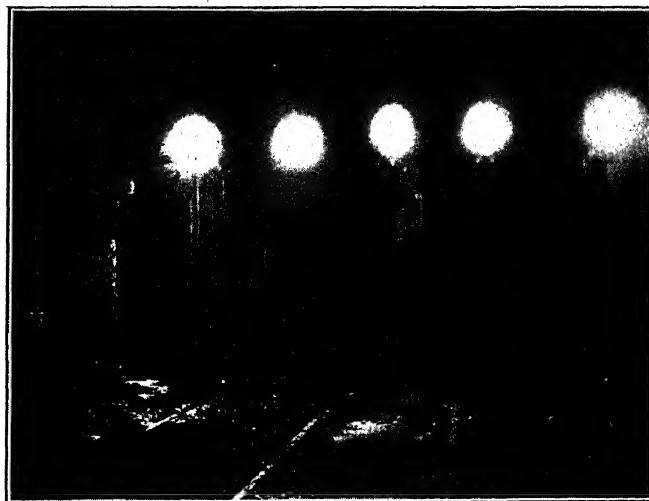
POORLY LIGHTED SHAFT BOTTOM.
